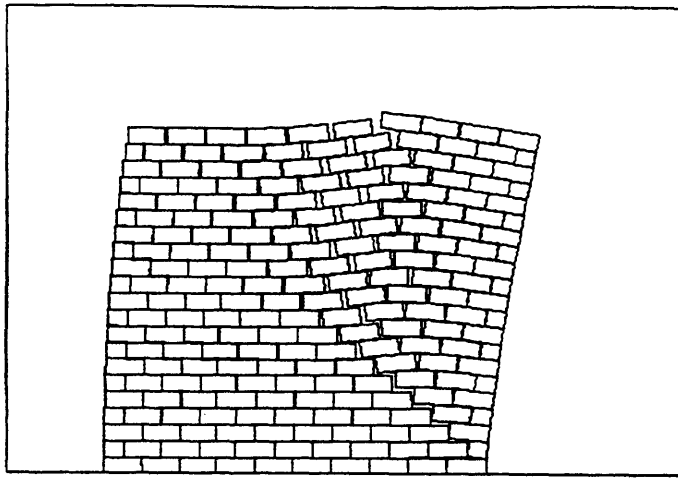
Failure mechanism of a 220-brick wall.
